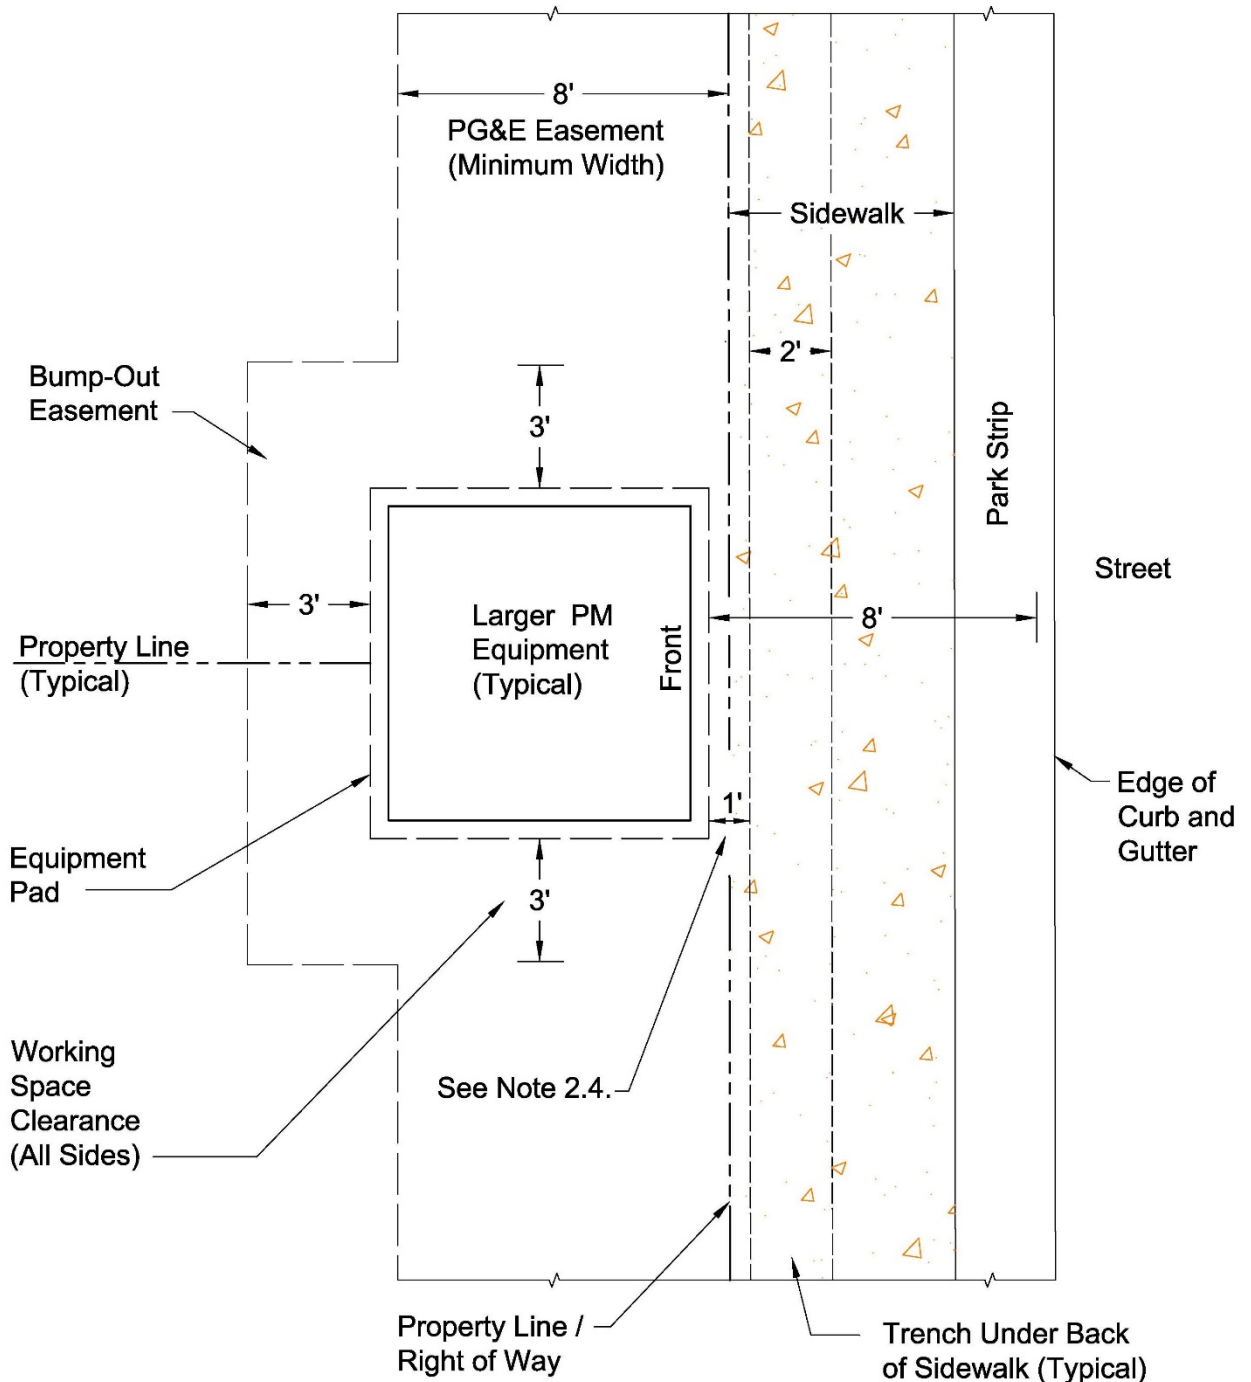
Large Pad-Mounted (PM) Equipment - Top View
